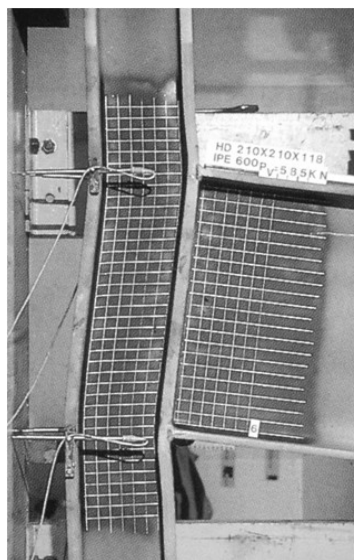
Shear distortion of joint with a weak panel zone (Krawinkler 1978)
